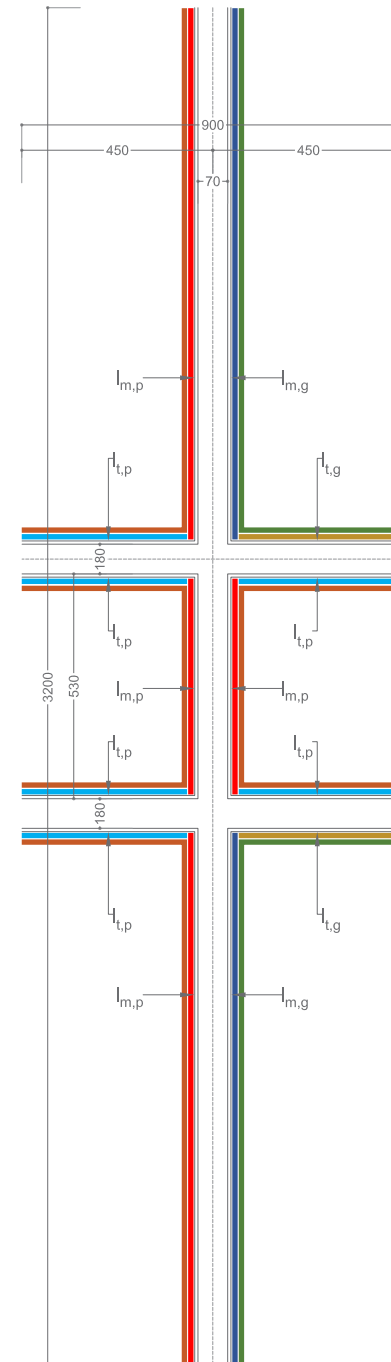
Enlarged elevation showing lengths of facade components of typical curtain walls (Source – Author)
